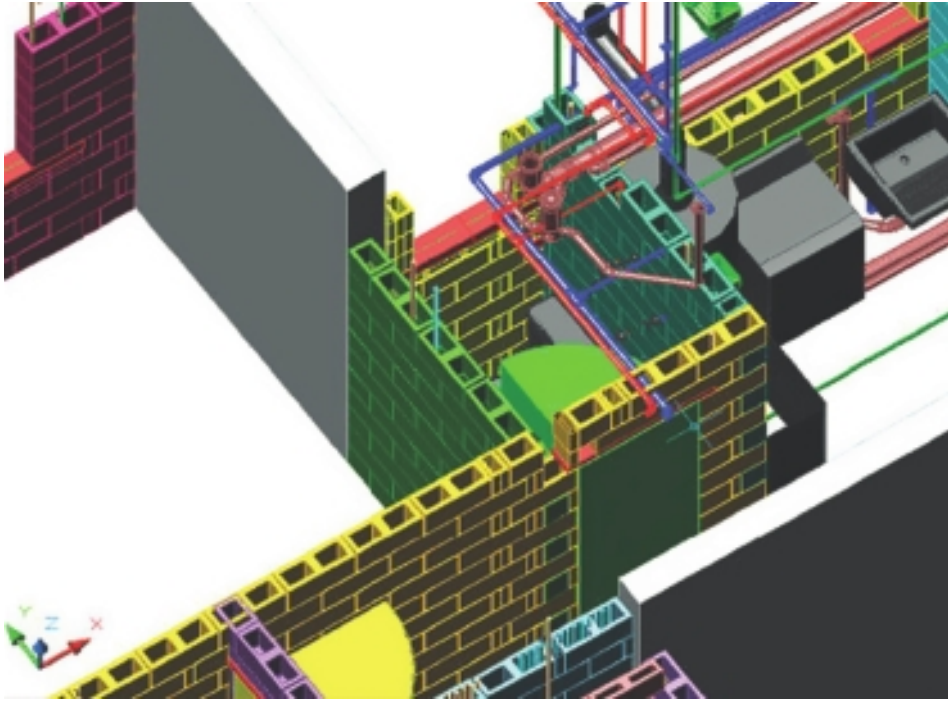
3-D model detail shows masonry, part of structure and plumbing kits.
